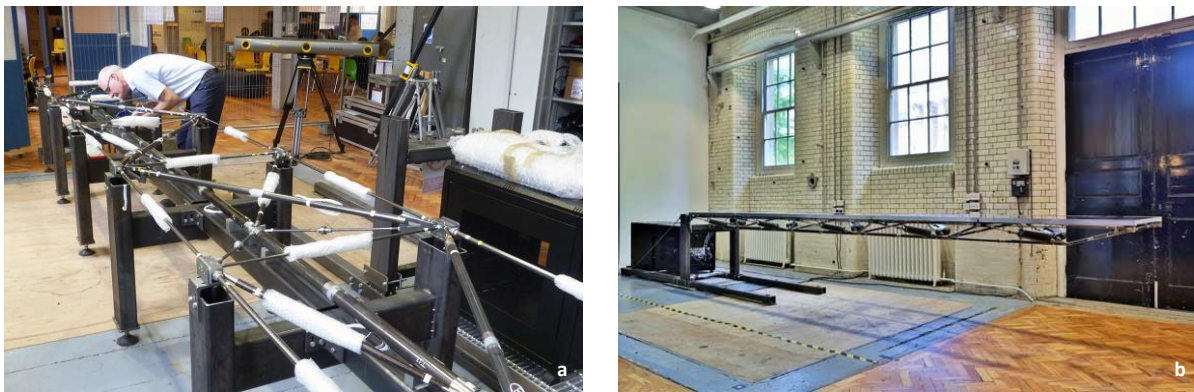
Adaptive Truss Prototype under construction (a) and finished (b)
